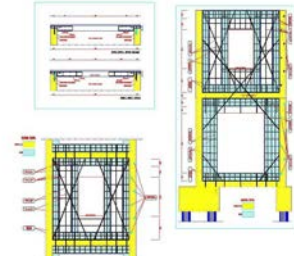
F: Seismic Strengthening- Details of New RC Shear Wall
